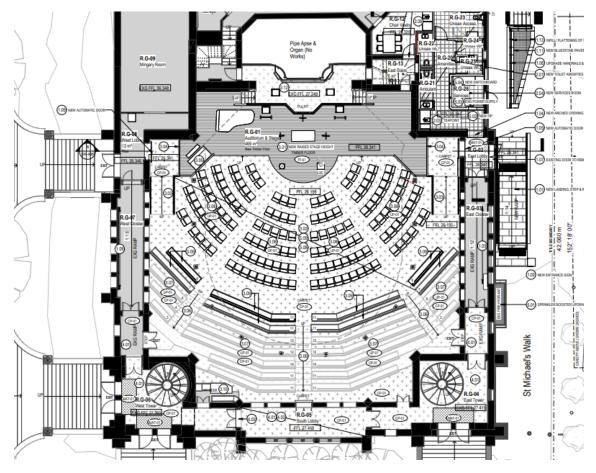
Proposed Ground Floor Plan. Source: Trethowan Architecture, 2024.
